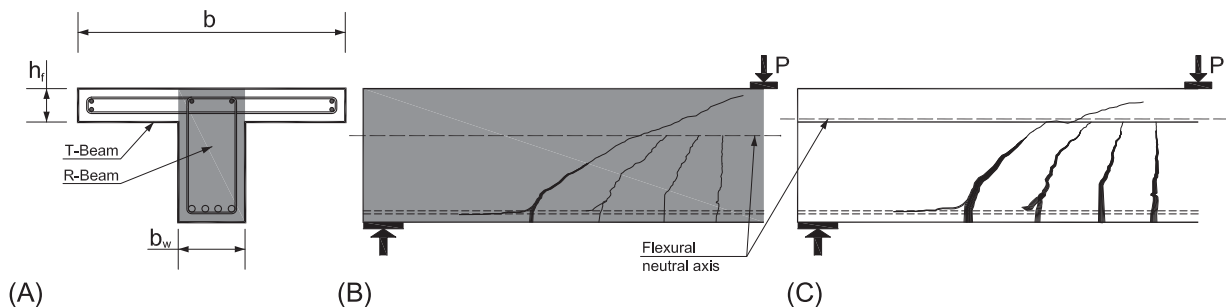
Comparison between T-shaped section beam and rectangular beam. (A) Sections. (B) Crack pattern scheme of a rectangular beam. (C) Crack pattern scheme of a T beam.
